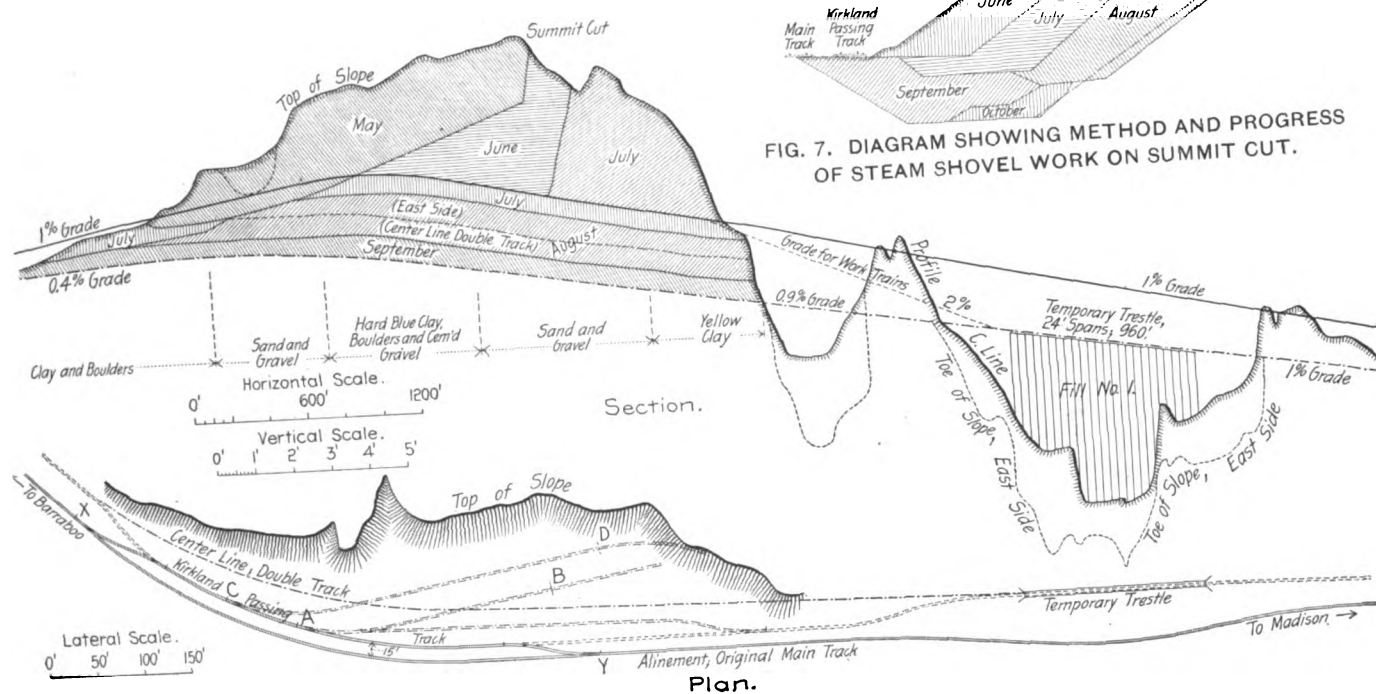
PLAN AND PROFILE OF SUMMIT CUT AND FILL.
